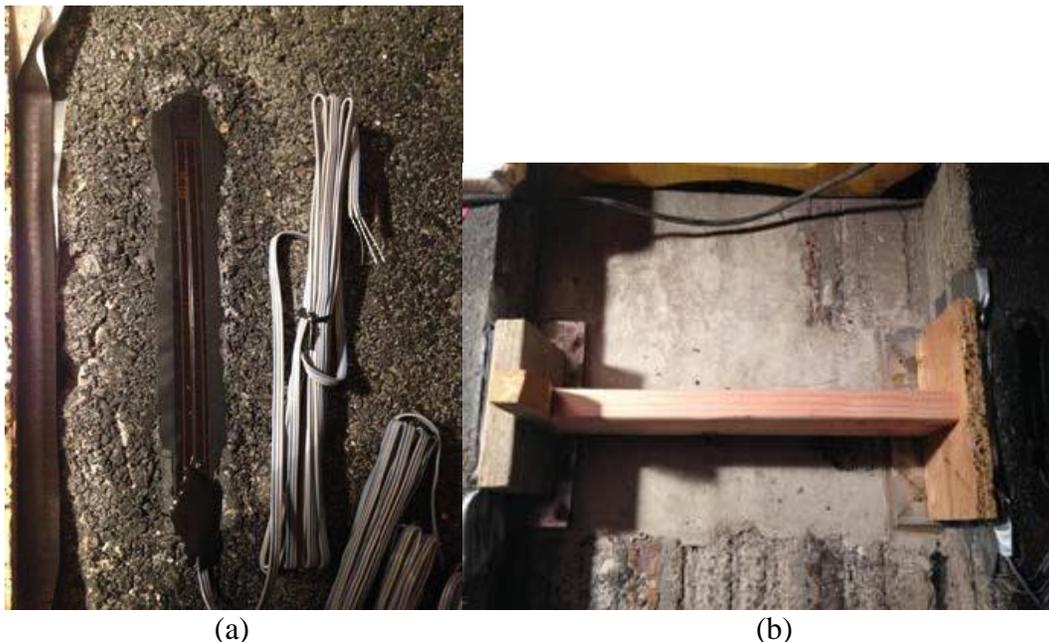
Installation of Vertical Surface Strain Gauges and Temporary Bracing.
